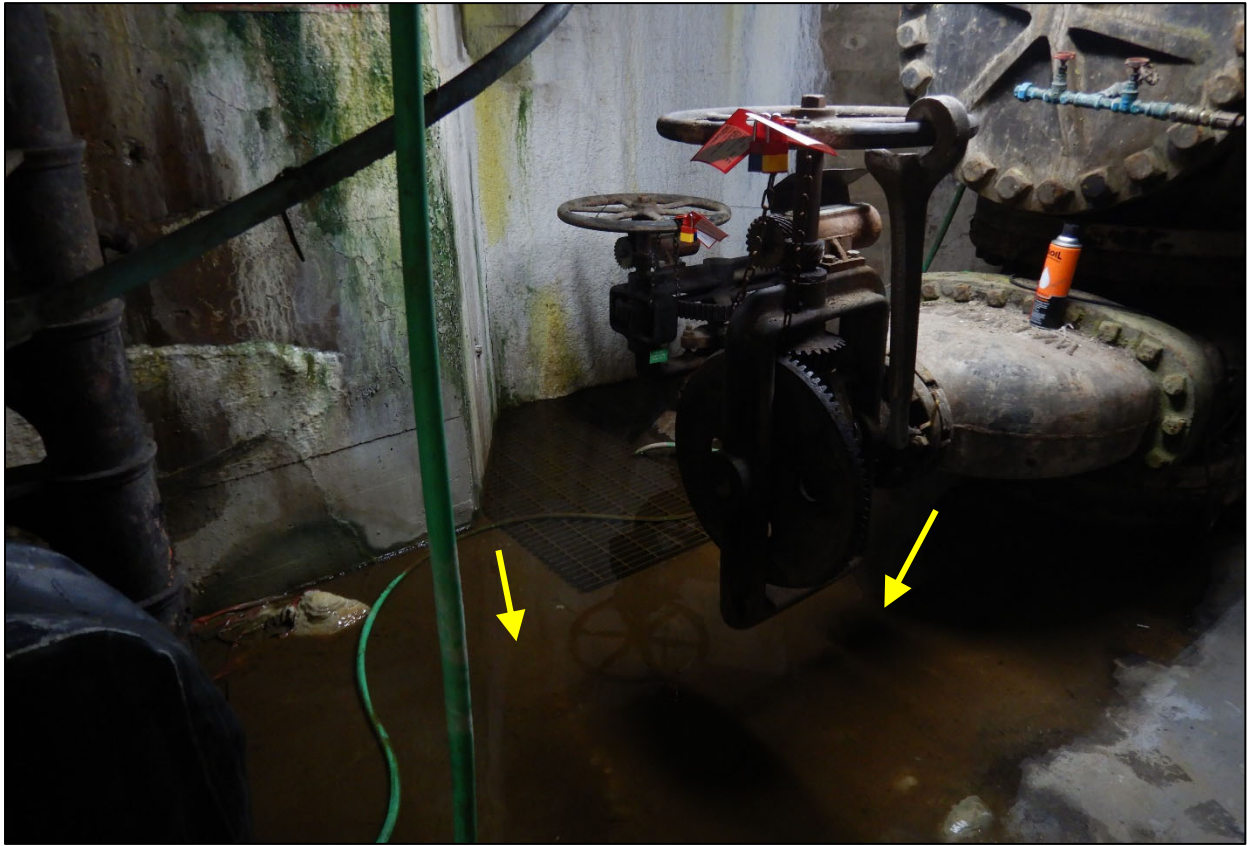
Ponded water by the Unit 4 controls in the powerhouse inspection tunnel
